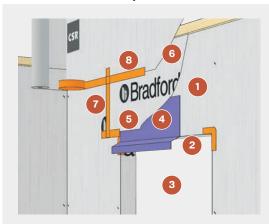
Typical Setout for Texture Base Sheet Battens/Top Hats
